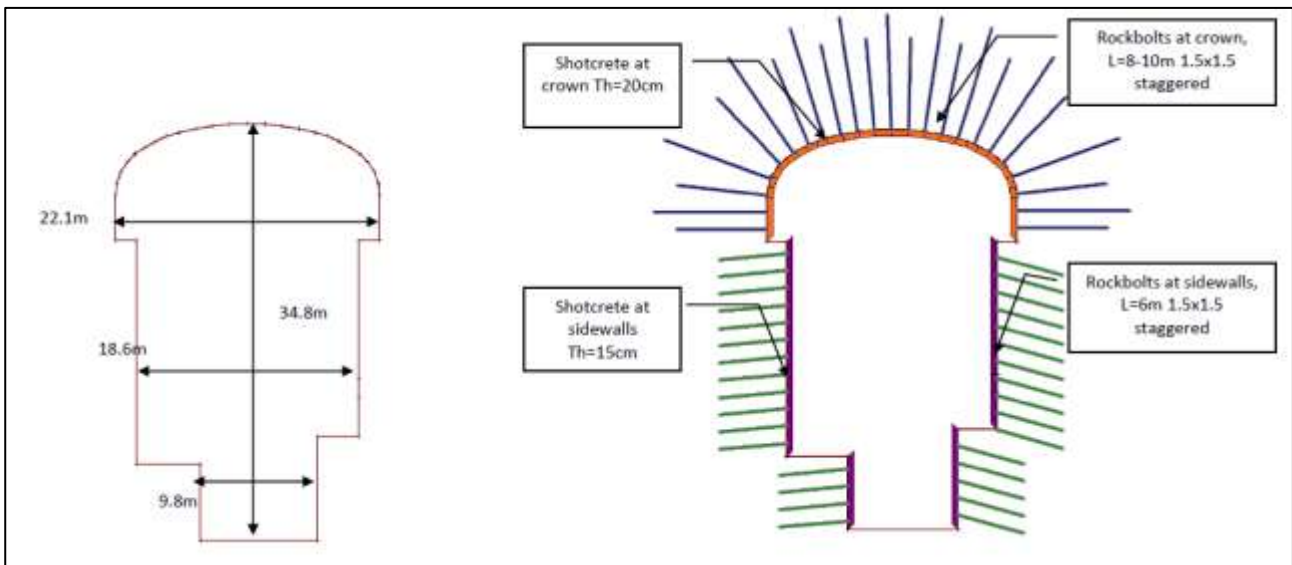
Cross-section of the caverns for the engine rooms of both hydroelectric power plants and an example of the planned type of substructure with anchors, sprayed concrete and steel mesh.
